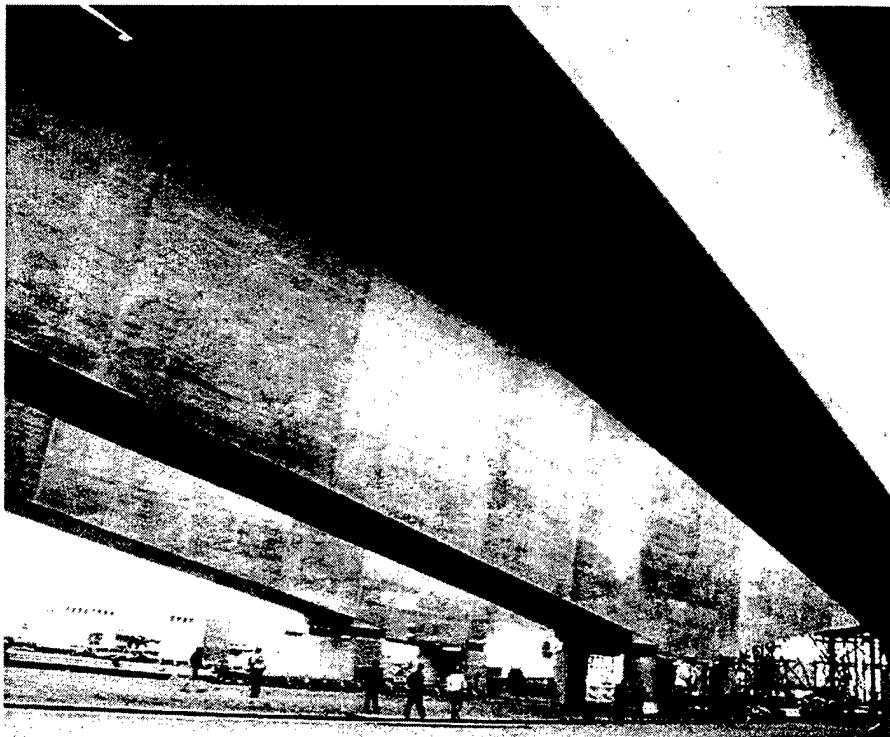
(b) Cantilever Construction of the Main Girder on Pillars
